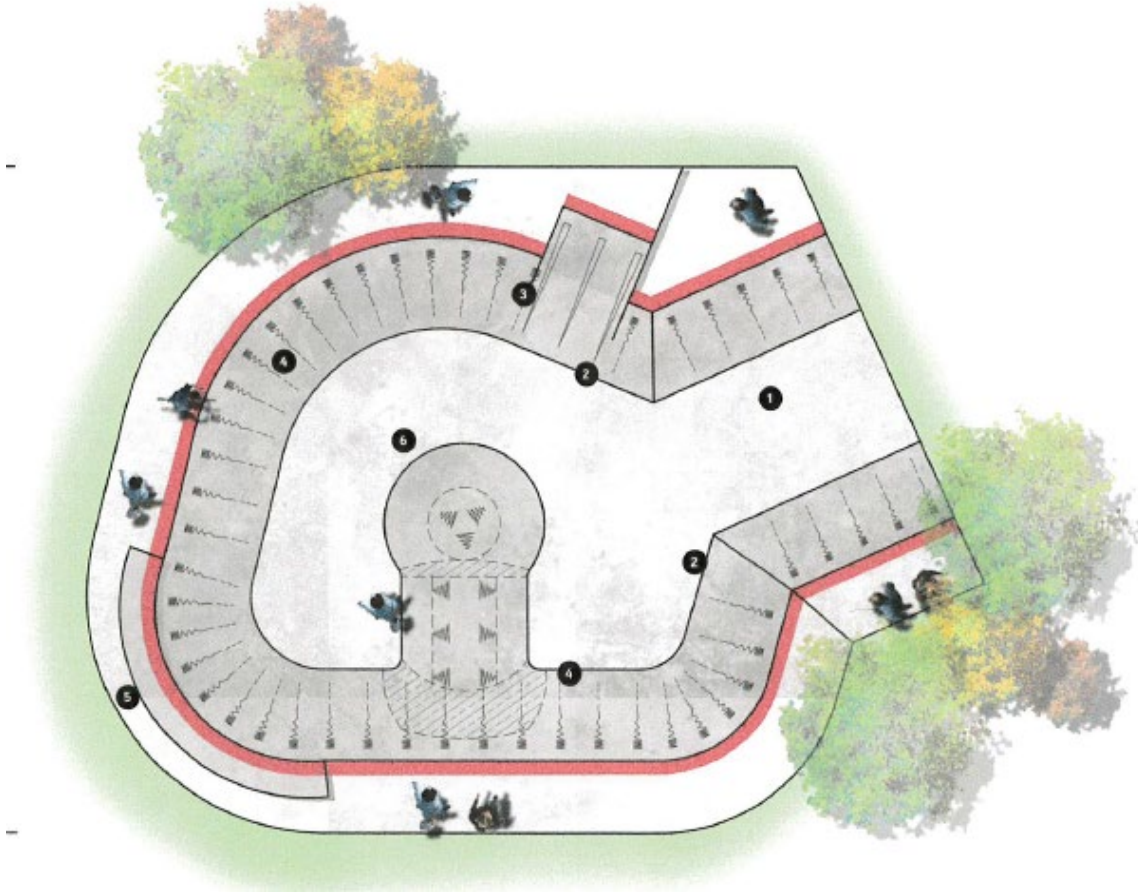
Architectural sketch of proposed development (supplied by Applicant)
